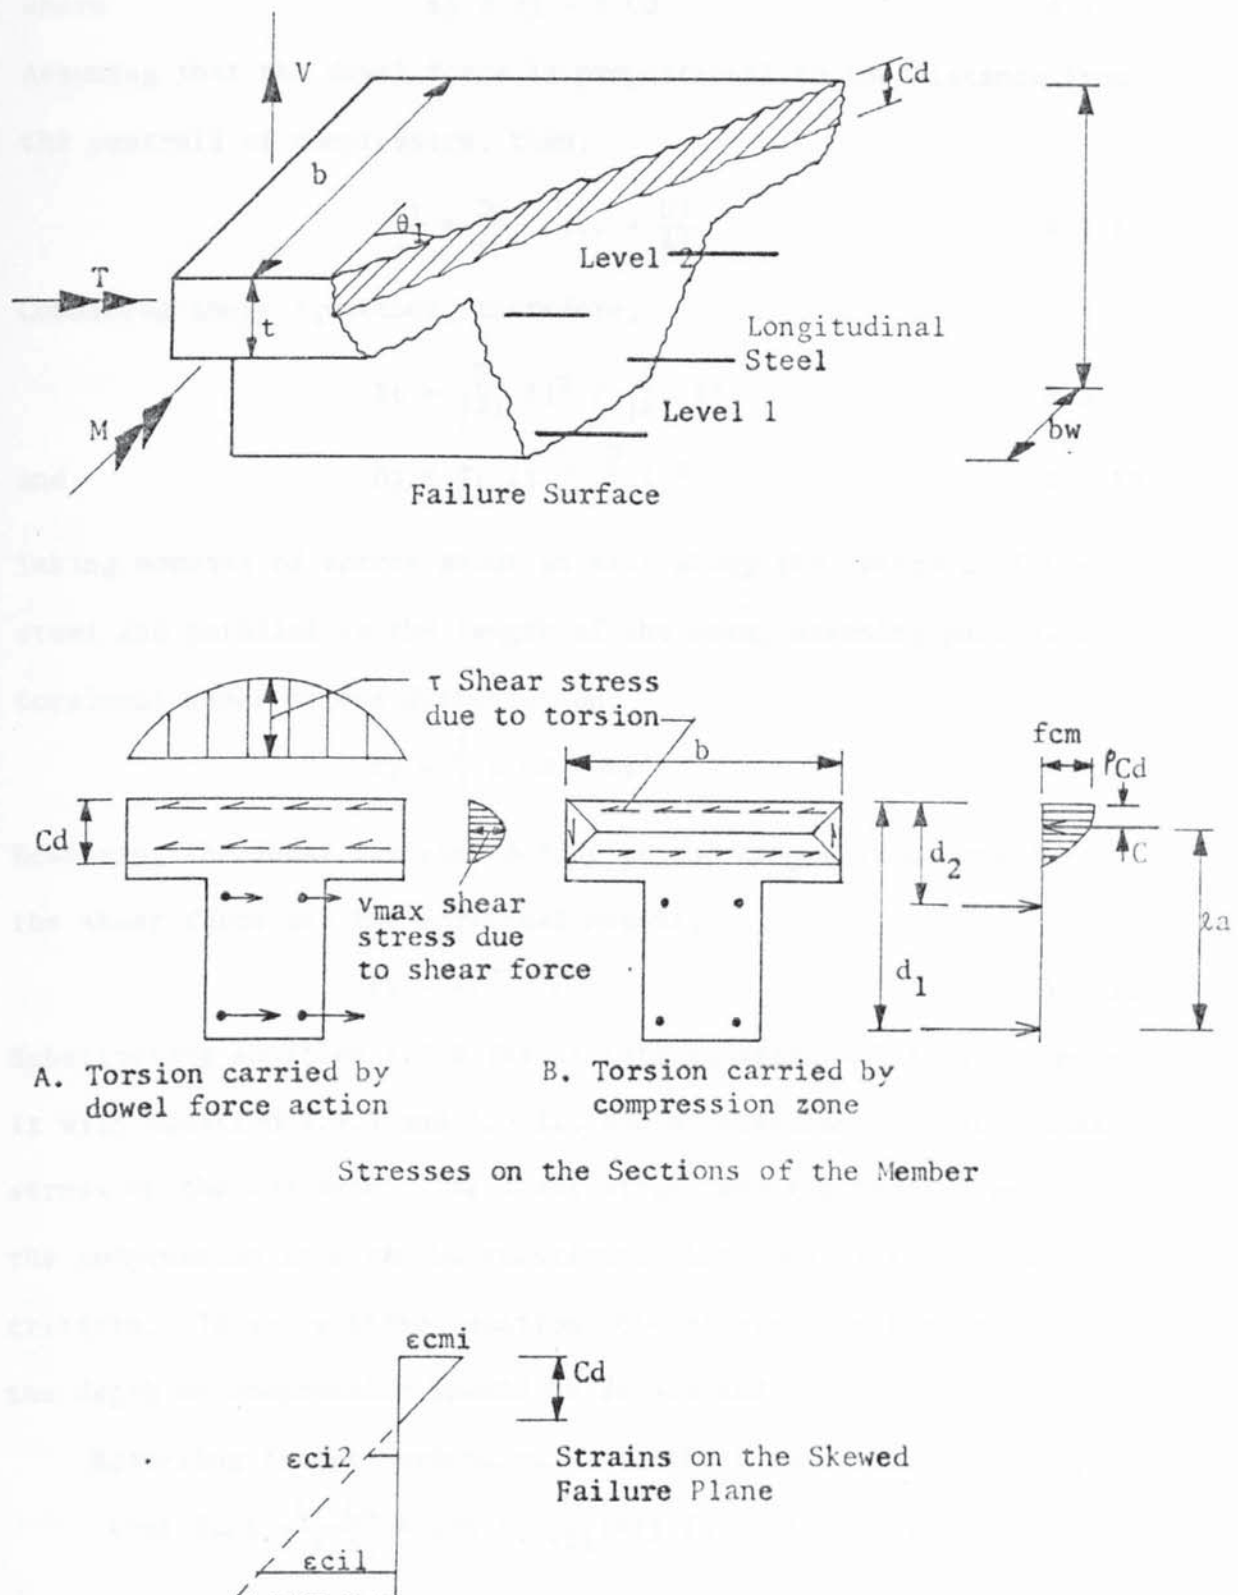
MODE ONE FAILURE IN PRESTRESSED CONCRETE T-MEMBERS SUBJECTED TO COMBINED LOADING - I.
